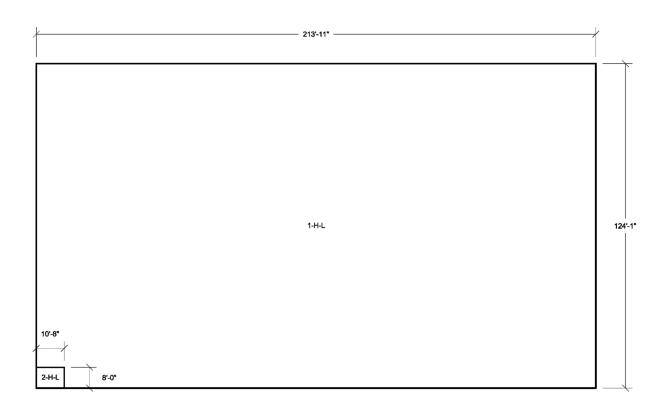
H.3-38 Elevation 95 Looking Down East-West Reinforcement Zones Near Side Face
